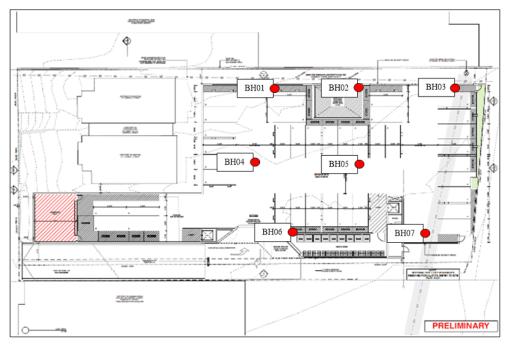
Borehole Plan (Preliminary Architect plans for ground level/basement)
